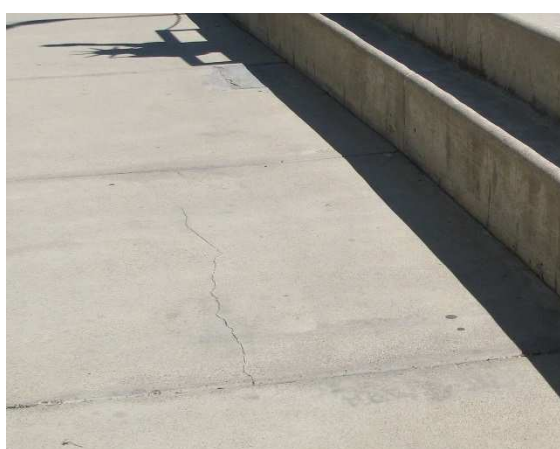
Moderate crack in sidewalk. Station S2+16
